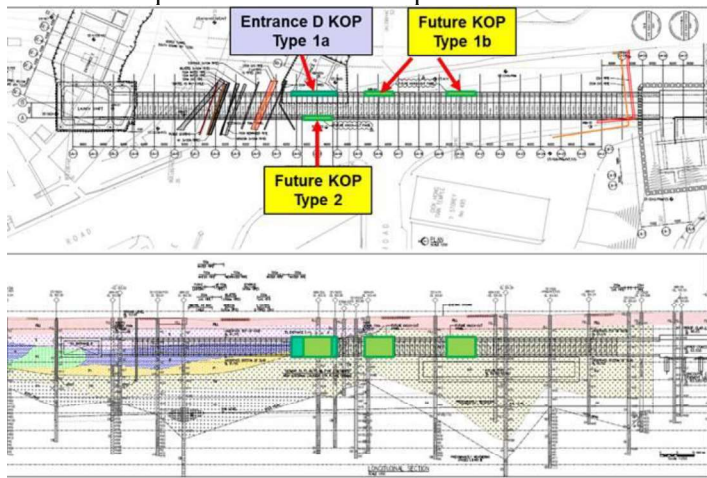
Plan and geotechnical longitudinal section (KOP=Knock out panel)
